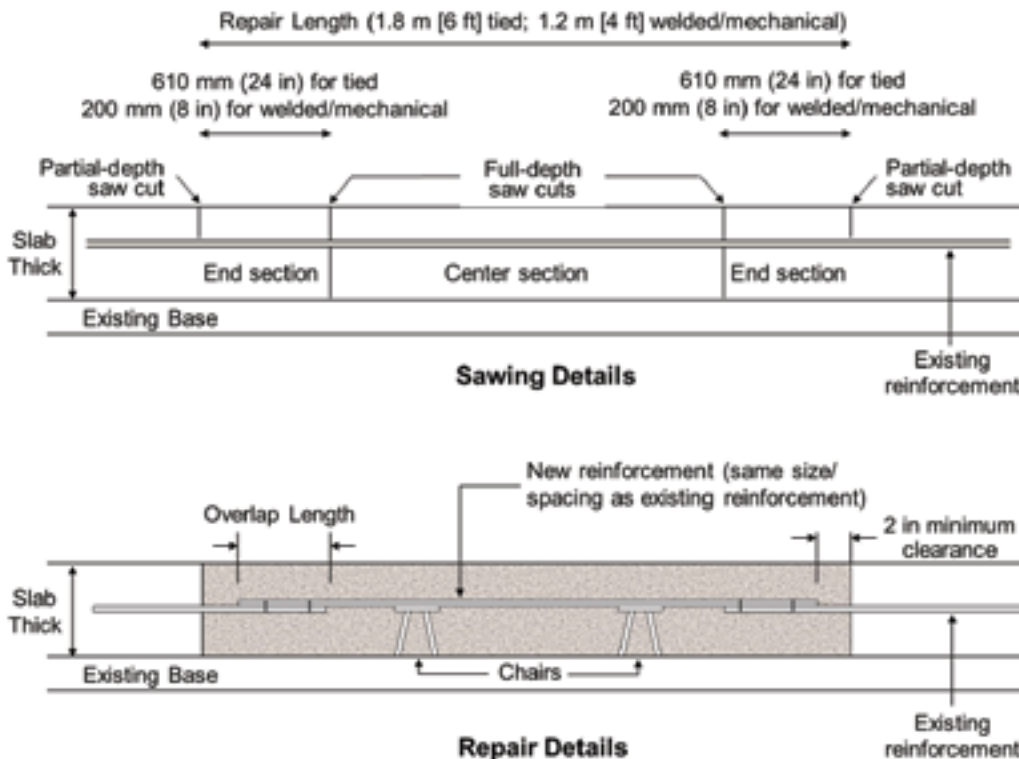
Summary of sawing and repair details for CRCP repairs
